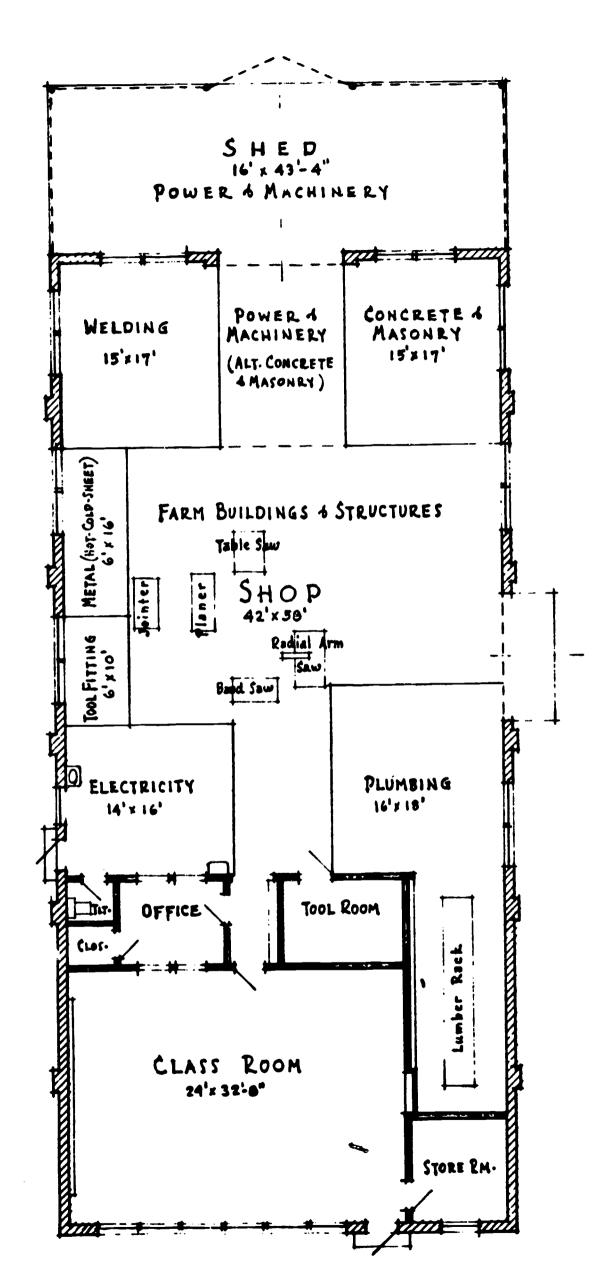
Area designations agriculture-laboratory building plan no. VAG-9 State Department of Education, Jackson, Mississippi 9/10/63
